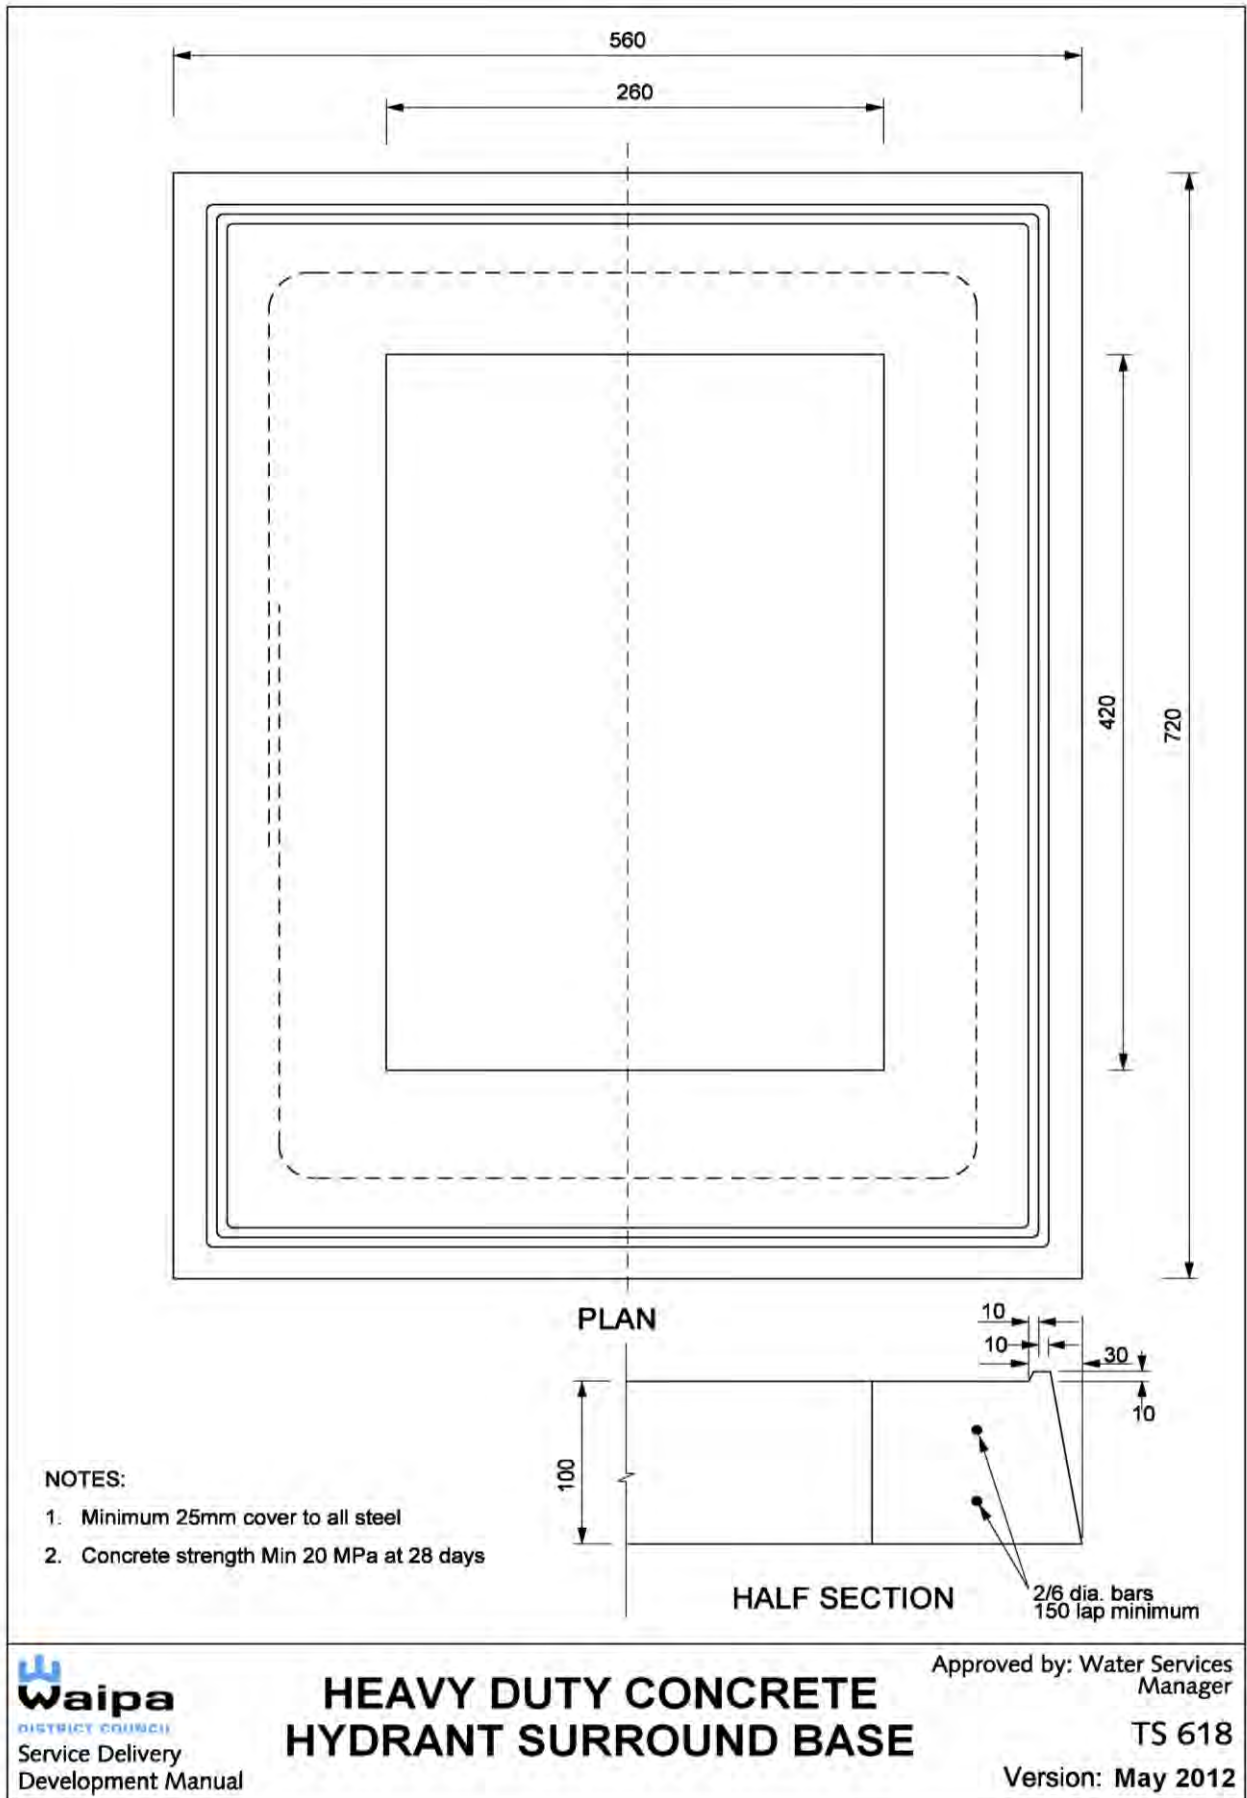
TS 618 Heavy duty concrete hydrant surround base
